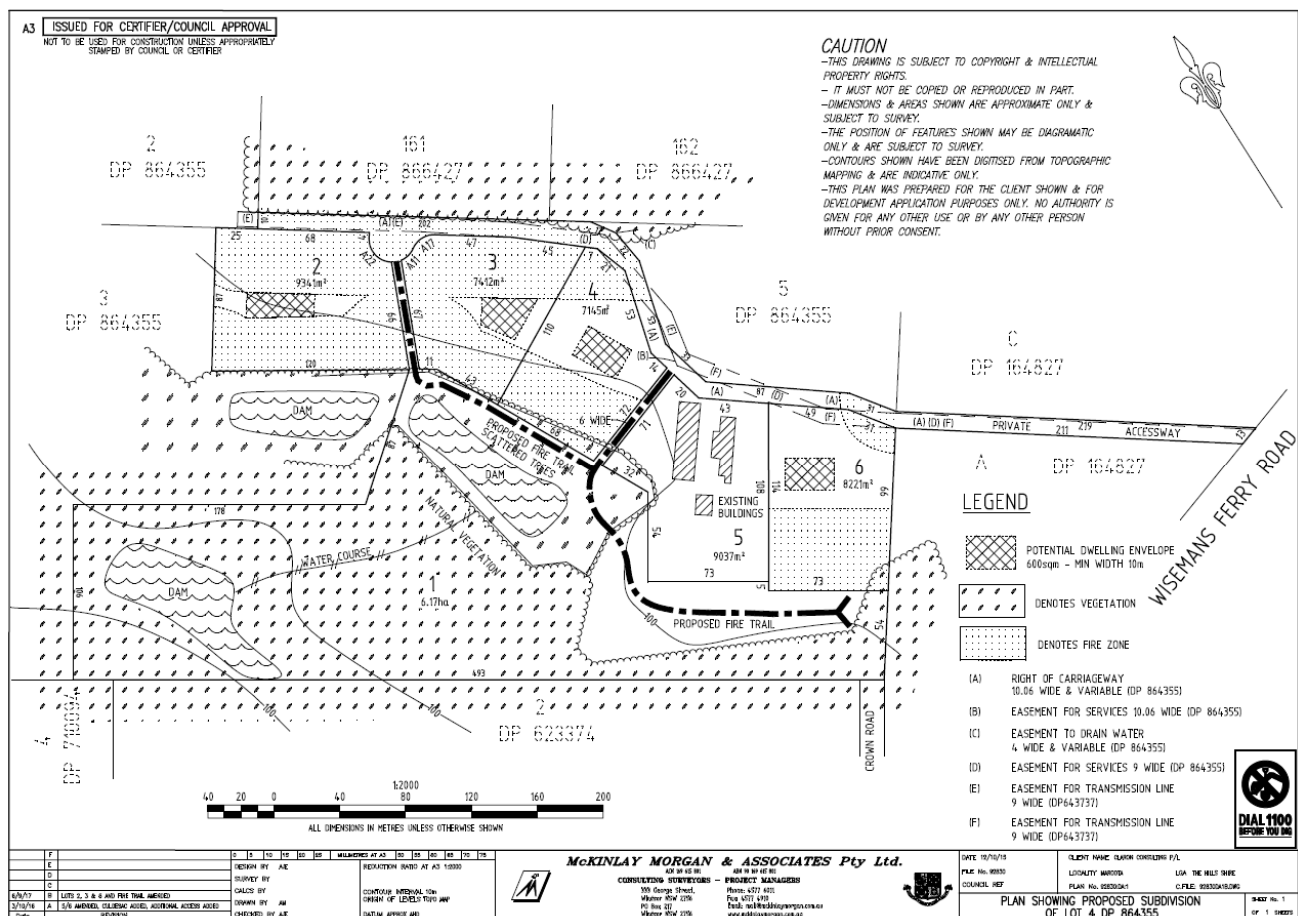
Extract from the proposed subdivision plan prepared by McKinlay Morgan & Associates (Plan No. 92830: DA:1, dated 12/10/15 REV: B 6/9/17)
